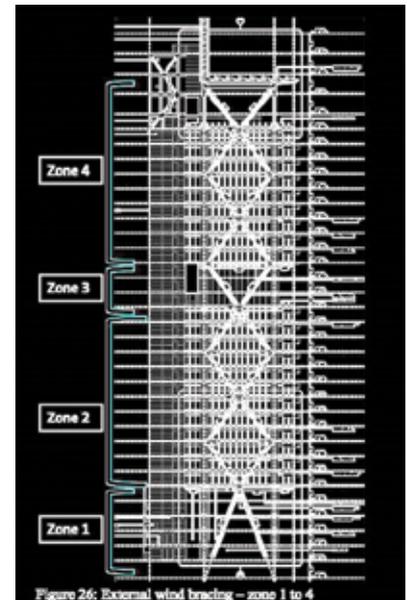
Fire zoning for consideration of lost bracing elements in the fire load case (Source: Arup)
